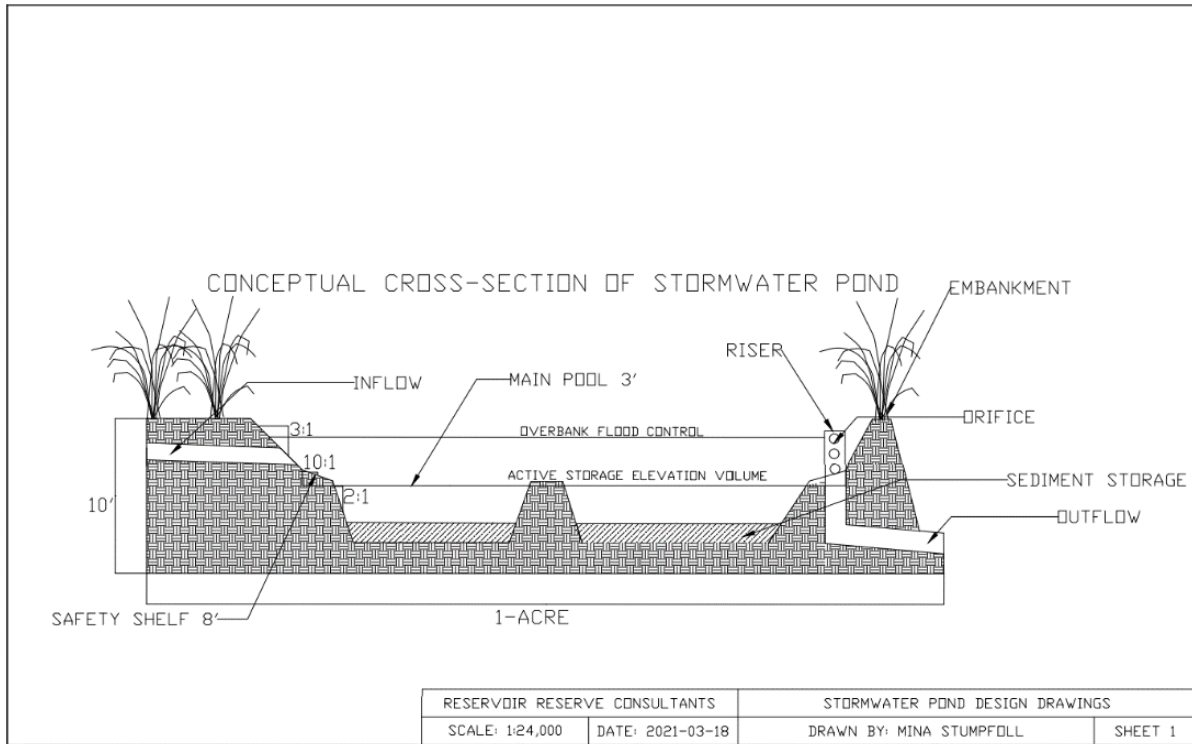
AutoCAD drawing of proposed Stormwater Retention Pond.
